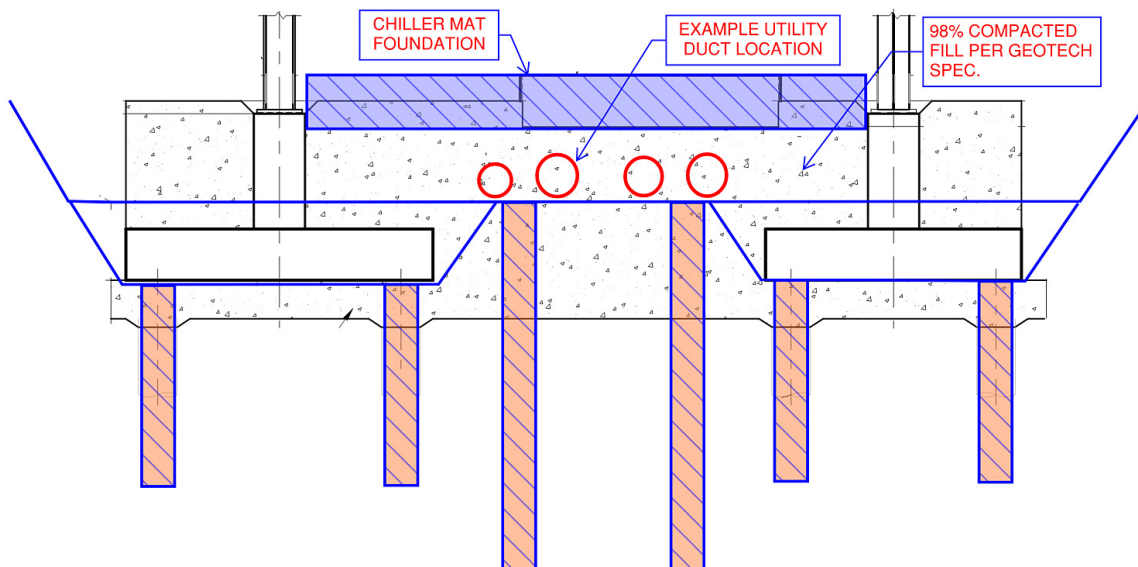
Example Utility Corridor with Lower RI Levels and Additional Engineered Backfill
